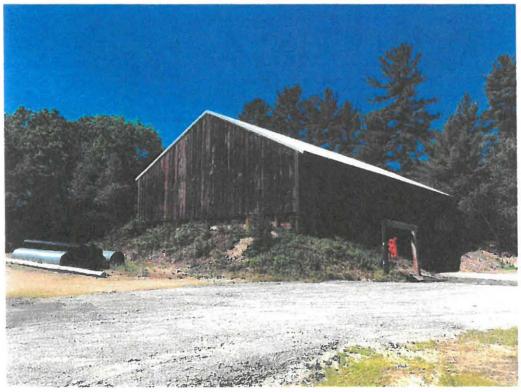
Loudon 316 – Sand fill used to hold push walls in place.
